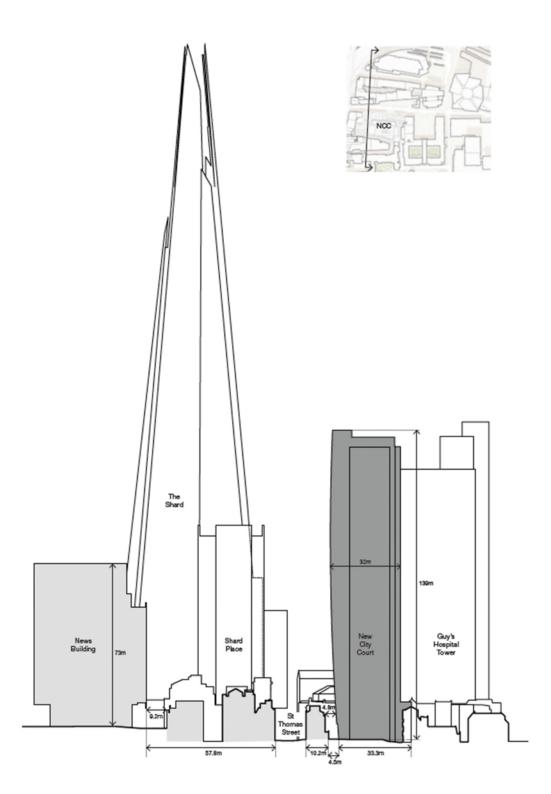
Diagrammatic section through St Thomas Street looking east, showing 2018 Scheme (Source: AHMM)
